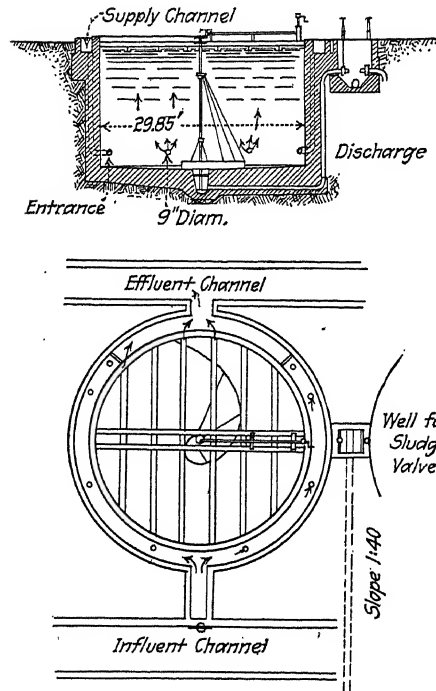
Spiral shaped sludge collector. (Fidler Patent.)
